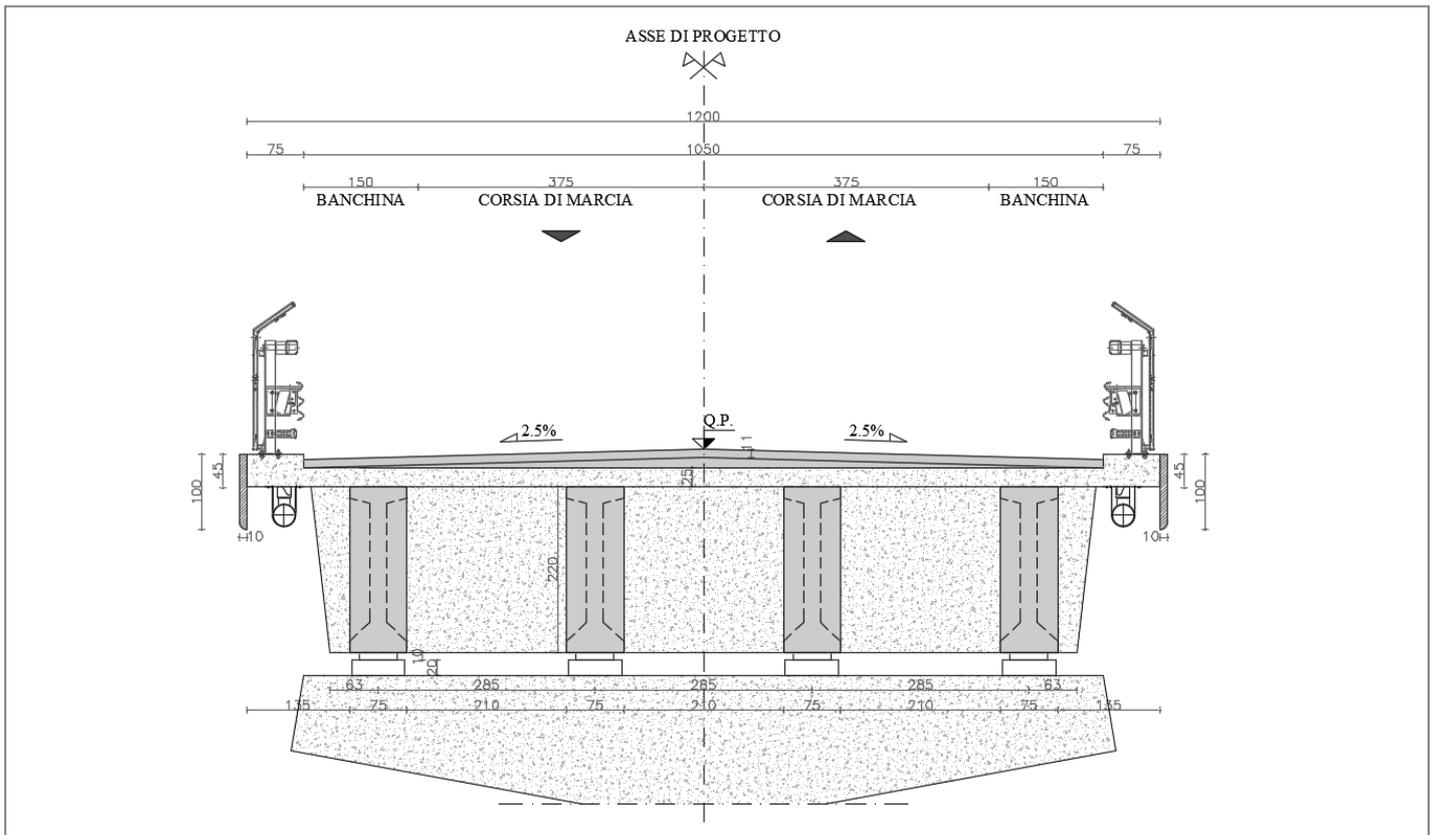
Bridge deck: cross section at pier / Impalcato: sezione trasversale in asse pila.
